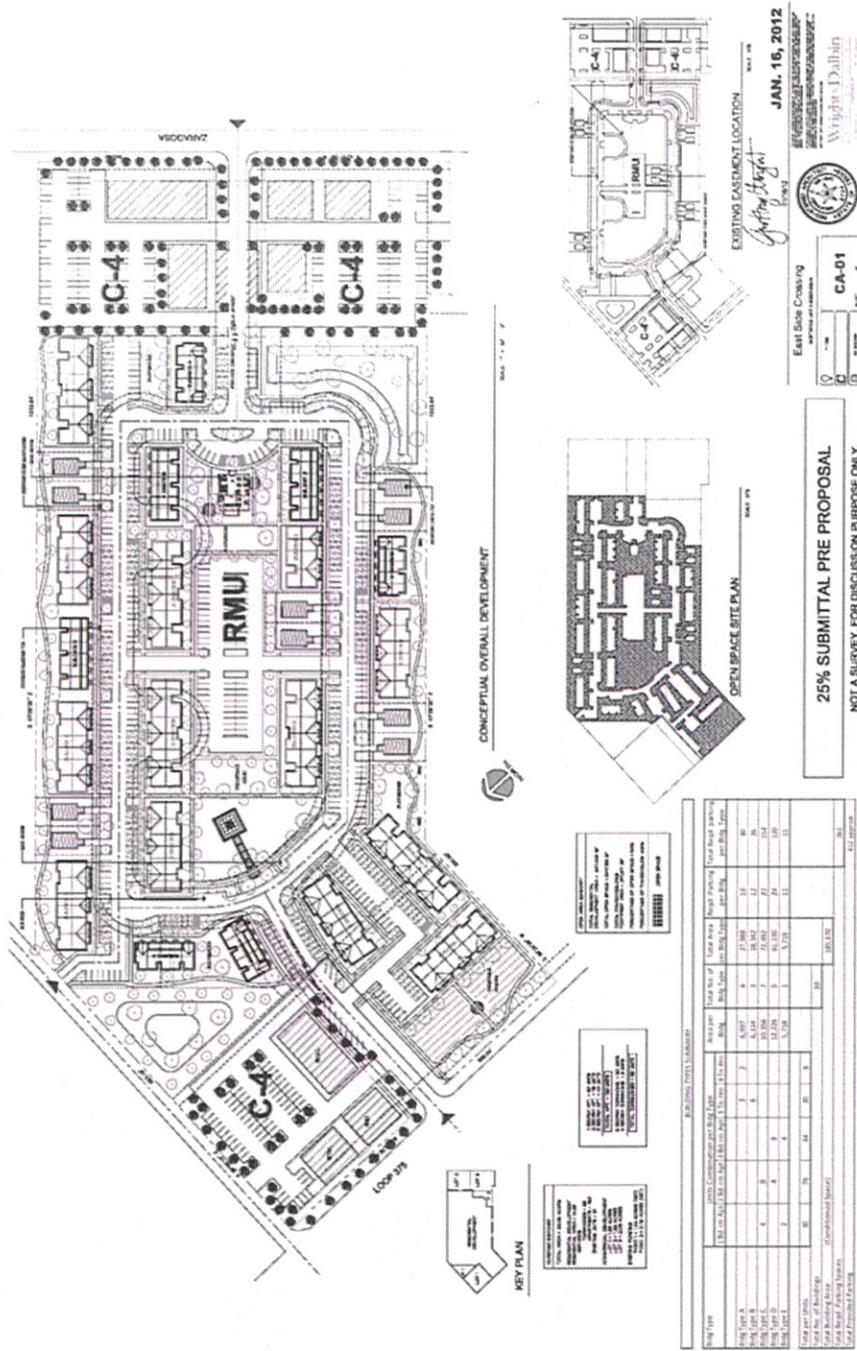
PROPOSED SITE LAYOUT AND ZONING MASTER PLAN
